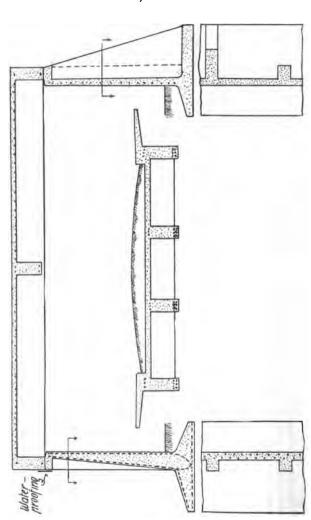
Longitudinal and Cross Section of Girder Bridge. 40t Span.
